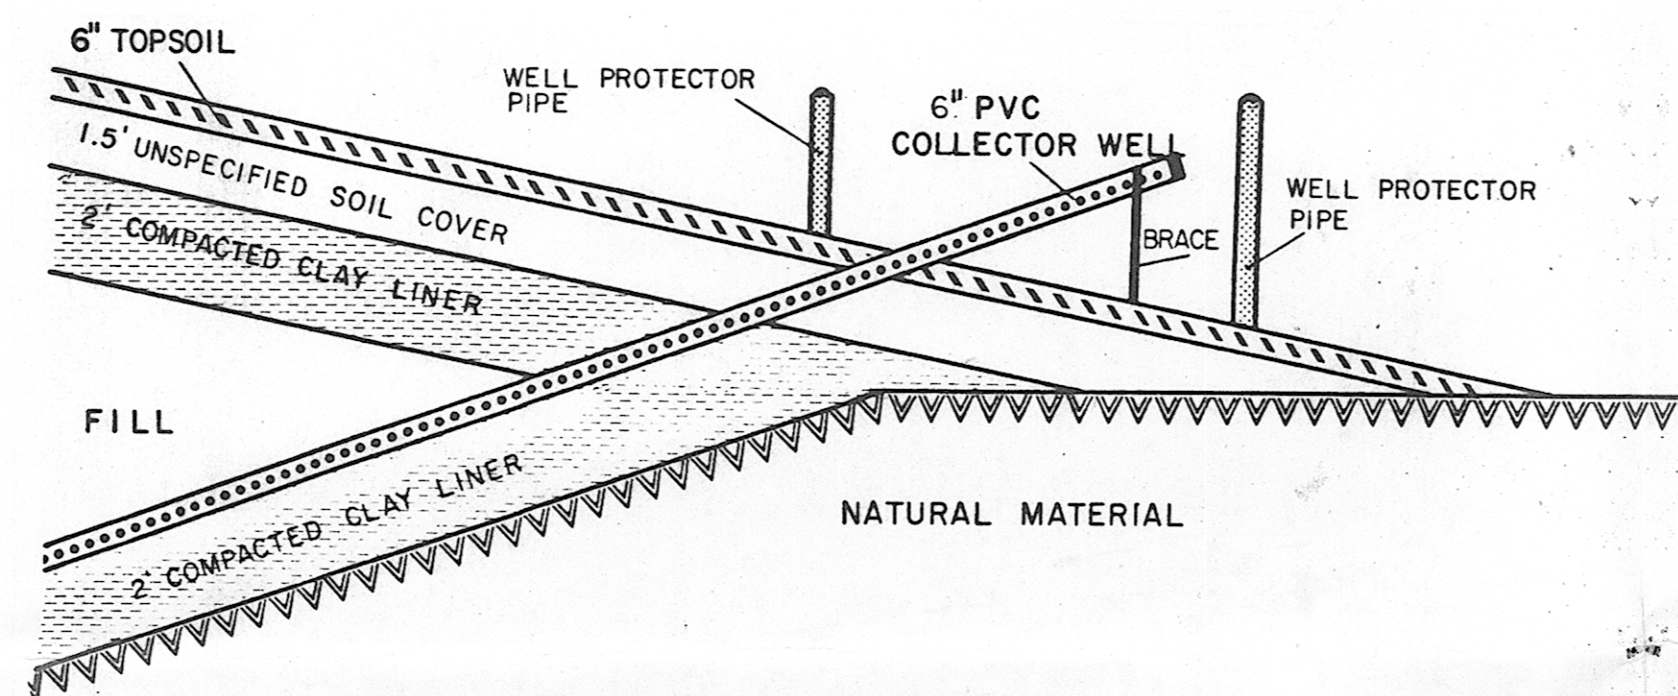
DETAIL A - TYPICAL LINER & SUMP CONSTRUCTION
